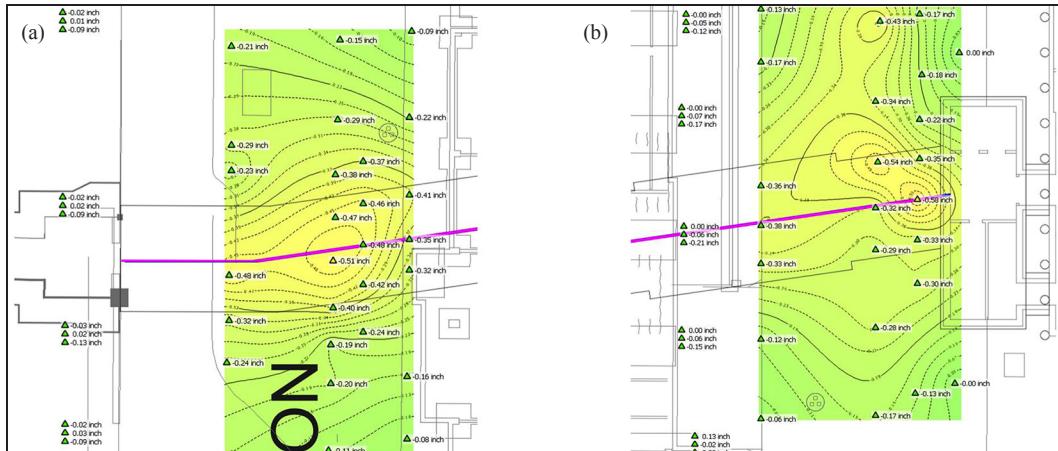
Settlement gradation view at (a) Union Street and (b) Front Street taken on 10/31/2021
